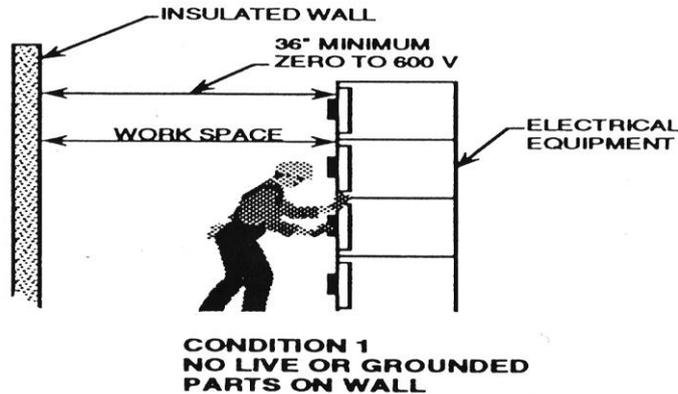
Clearances in front of electrical equipment with ungrounded wall opposite equipment.
